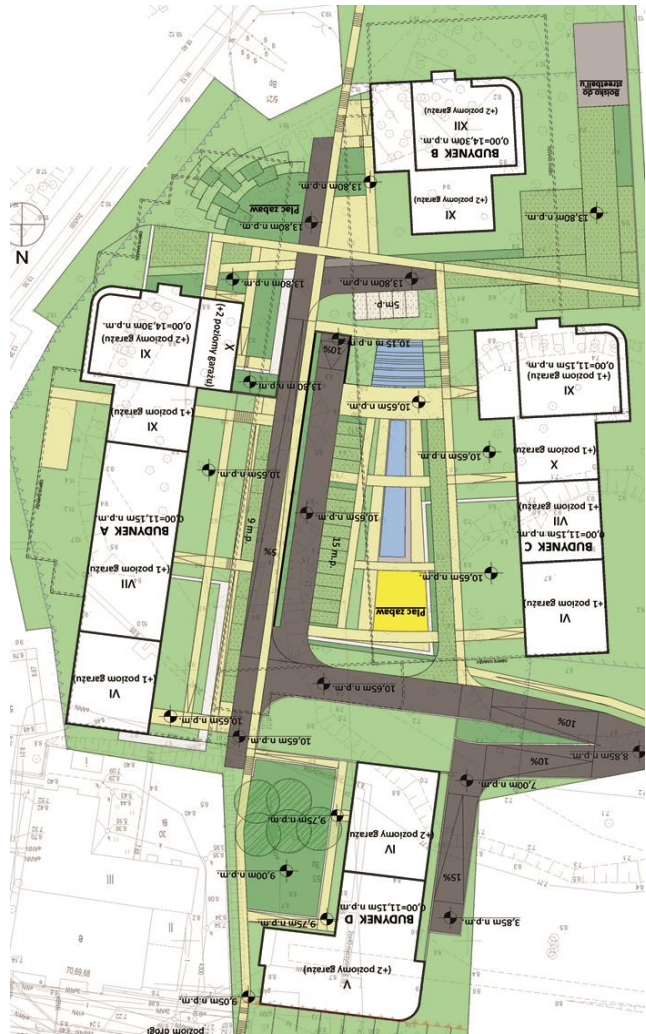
"Nautica" multi-family housing complex, "site development plan. Source: the author
